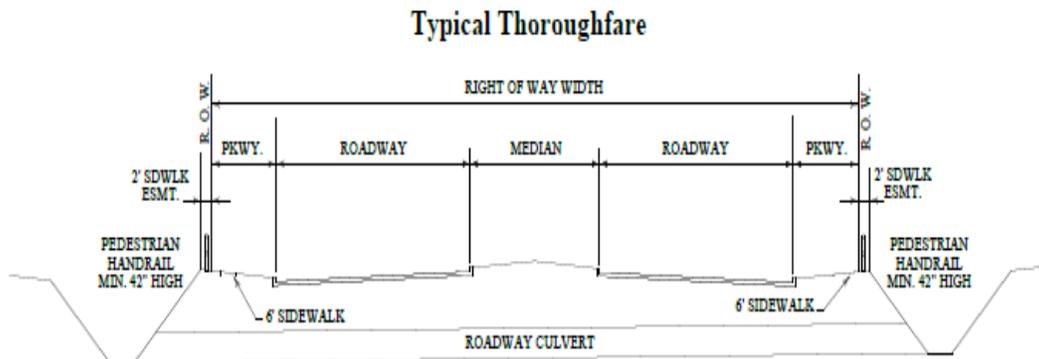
Typical Pedestrian Handrail over Culvert
